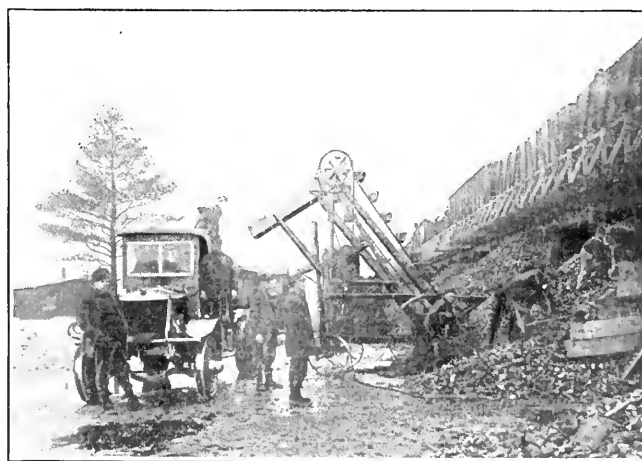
"CLOSE-UP" VIEW OF LOADING MACHINE
